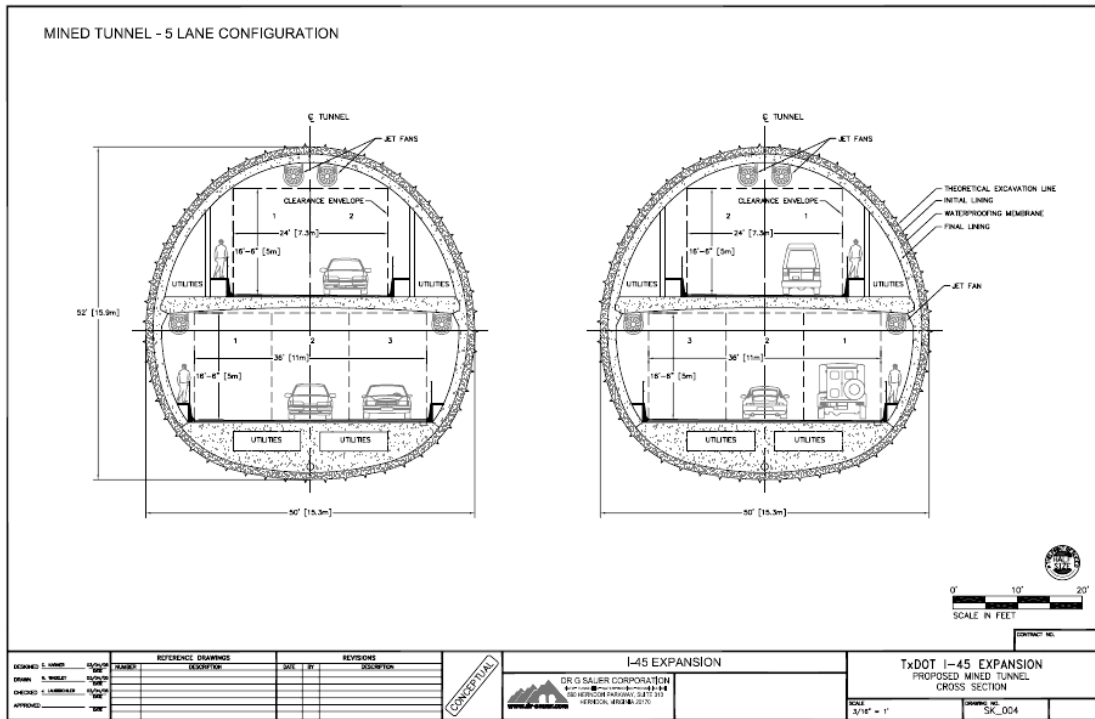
I-45 Alternative Design, Roadway Tunnel Cross Section
